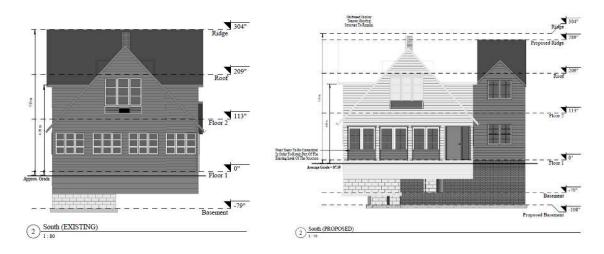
Existing and proposed front façades, 869 Sangster Avenue. (Images from owners.)
